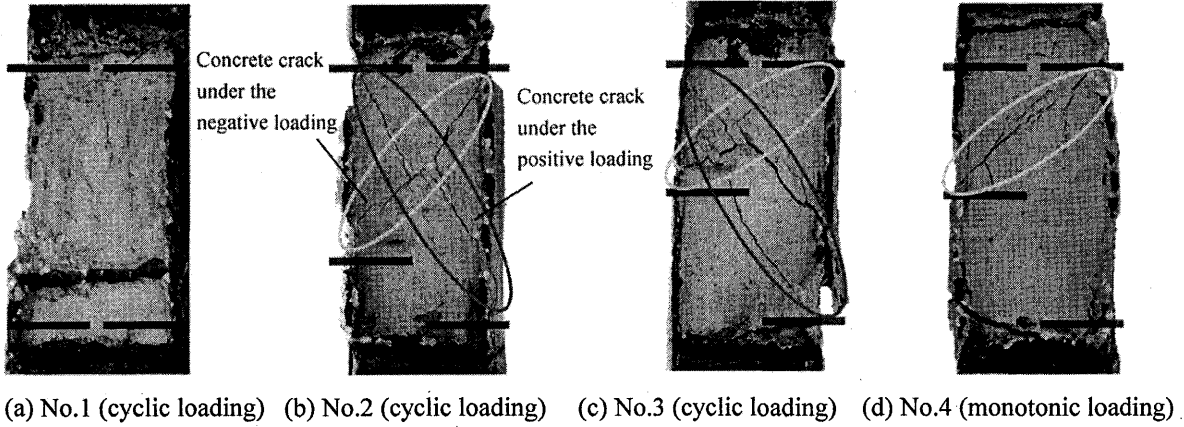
Typical failure modes of core concrete under monotonic and cyclic loading
